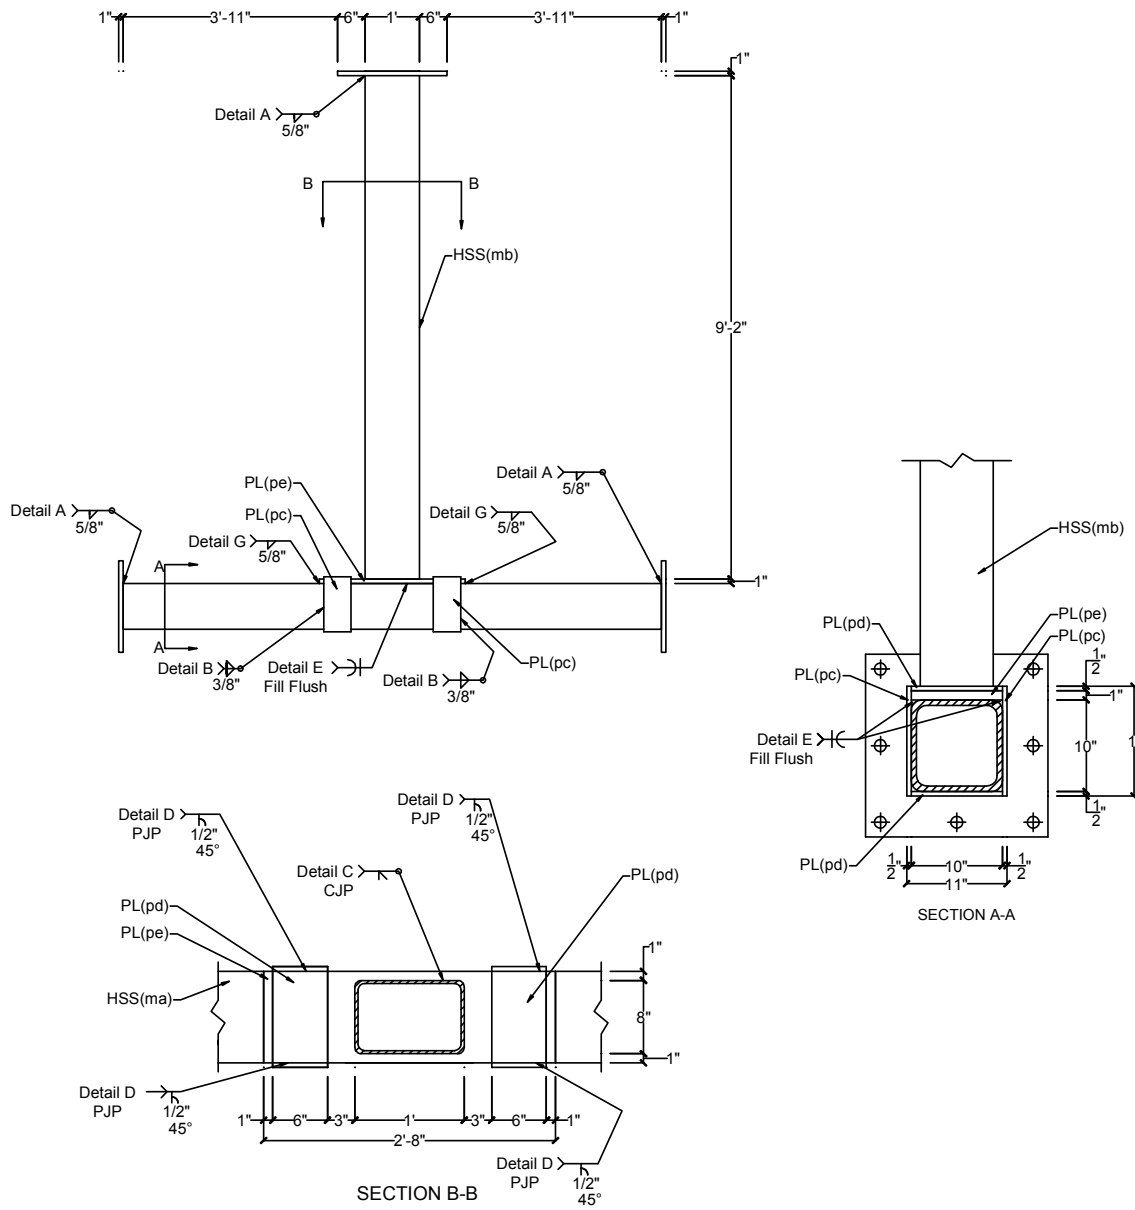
Collar Connection without Stiffeners (units in inch)
